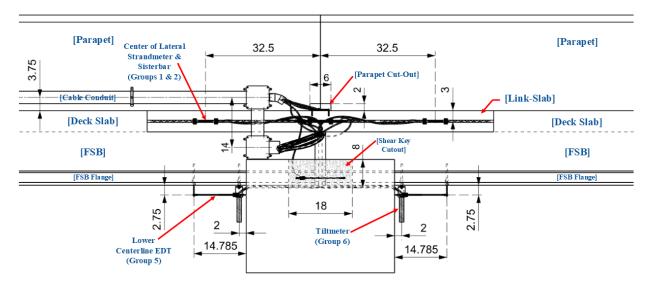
, Drawing, Bridge Side View No.2 (Detail of Link-Slab)
